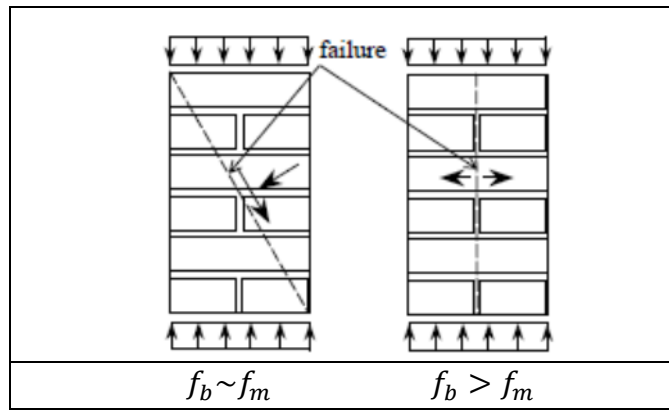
Compressive failure modes of masonry column (Hansen & Nielsen 2005)
